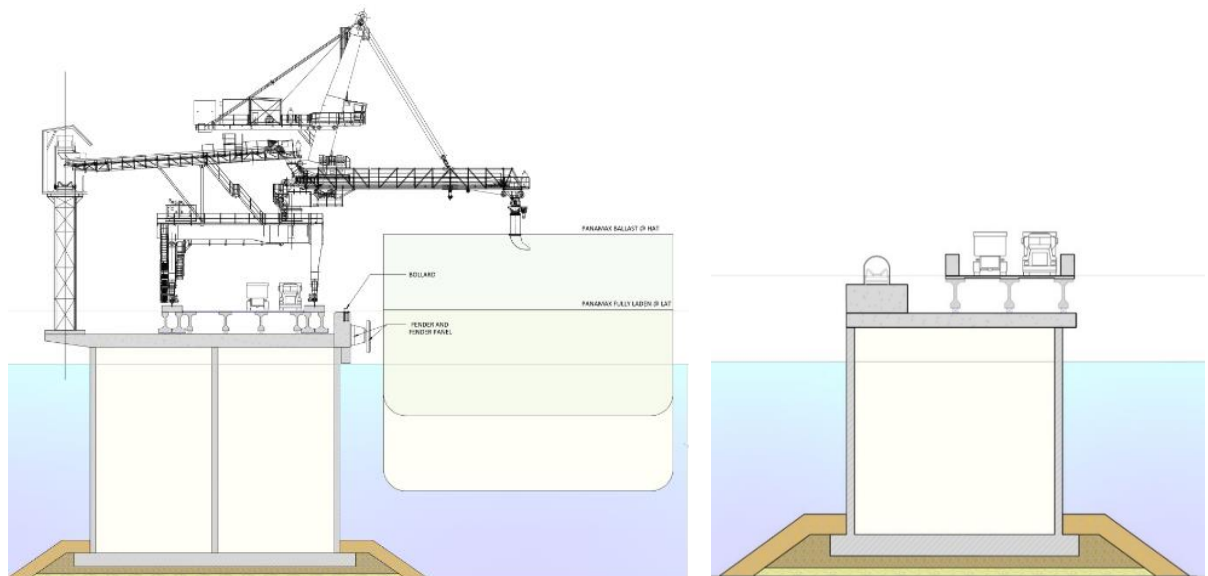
Cross-section of the caisson quay wall at the berth
